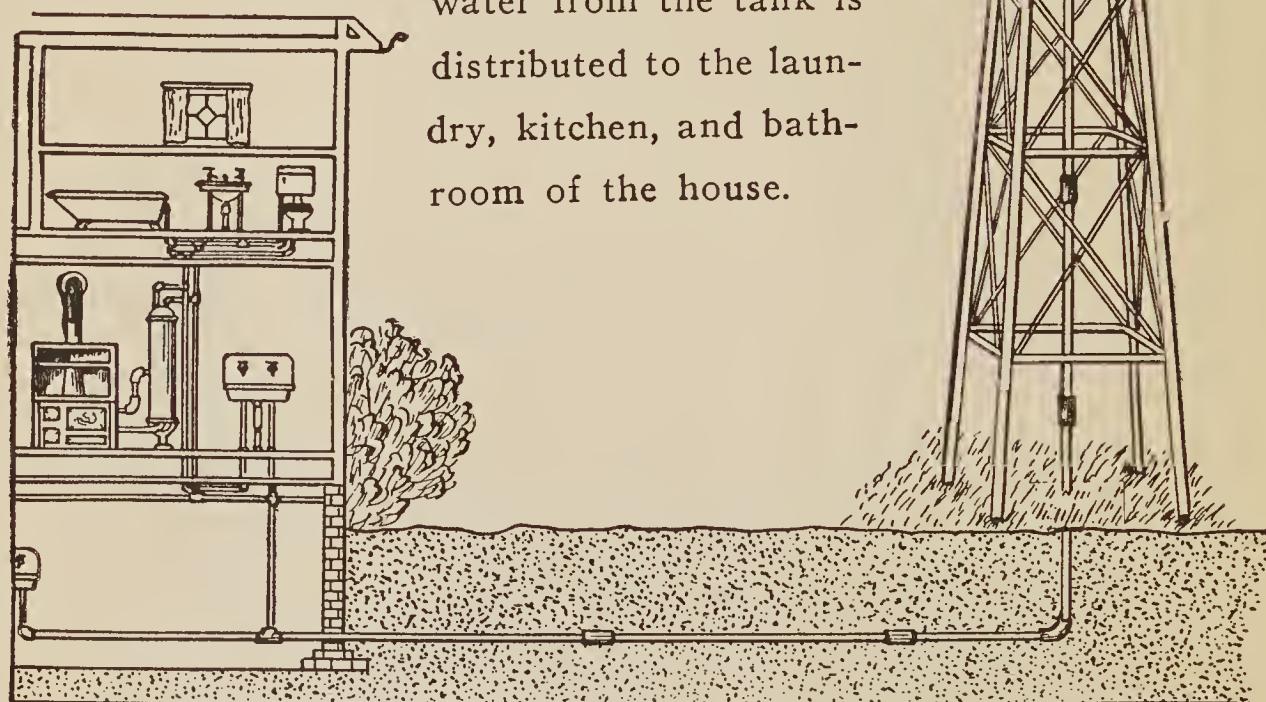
Showing How Water is Distributed in the House to the Basement Laundry, Kitchen and Bath Room.
